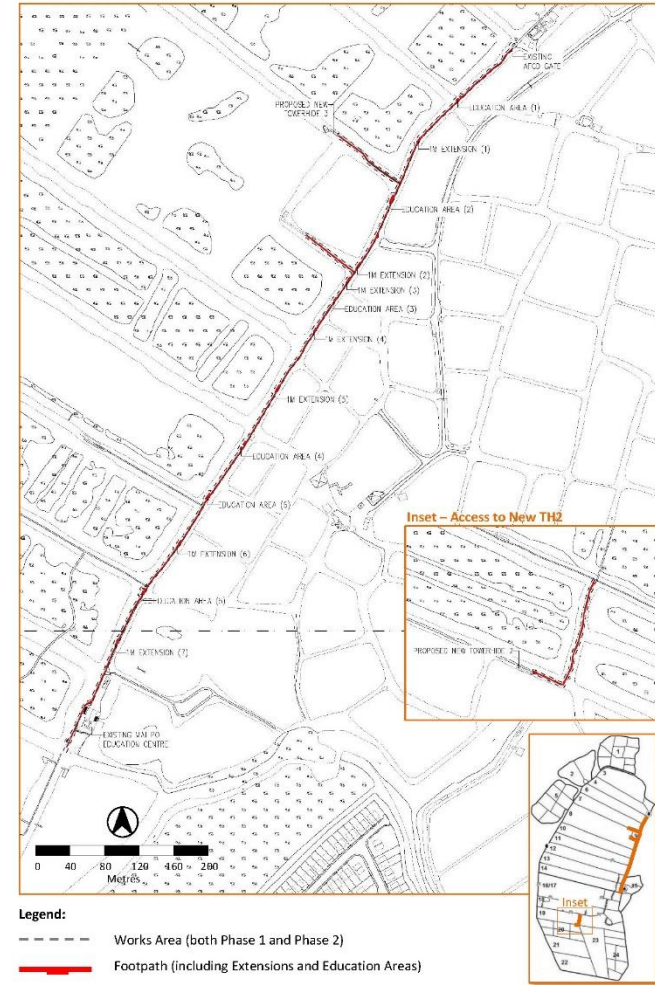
Layout Plan Showing Construction of New Boardwalks (Indicative)
